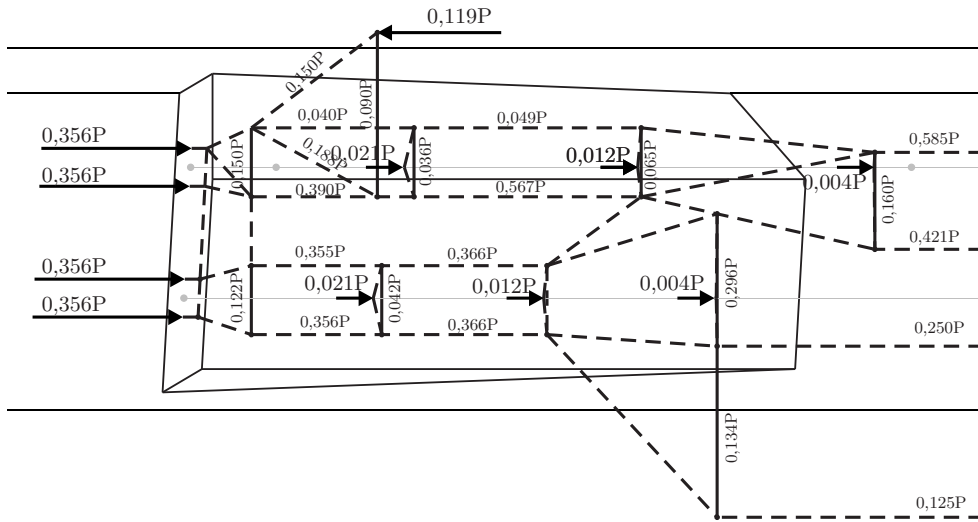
Strut and tie model - Top plan view (detail of the anchorage zone)
